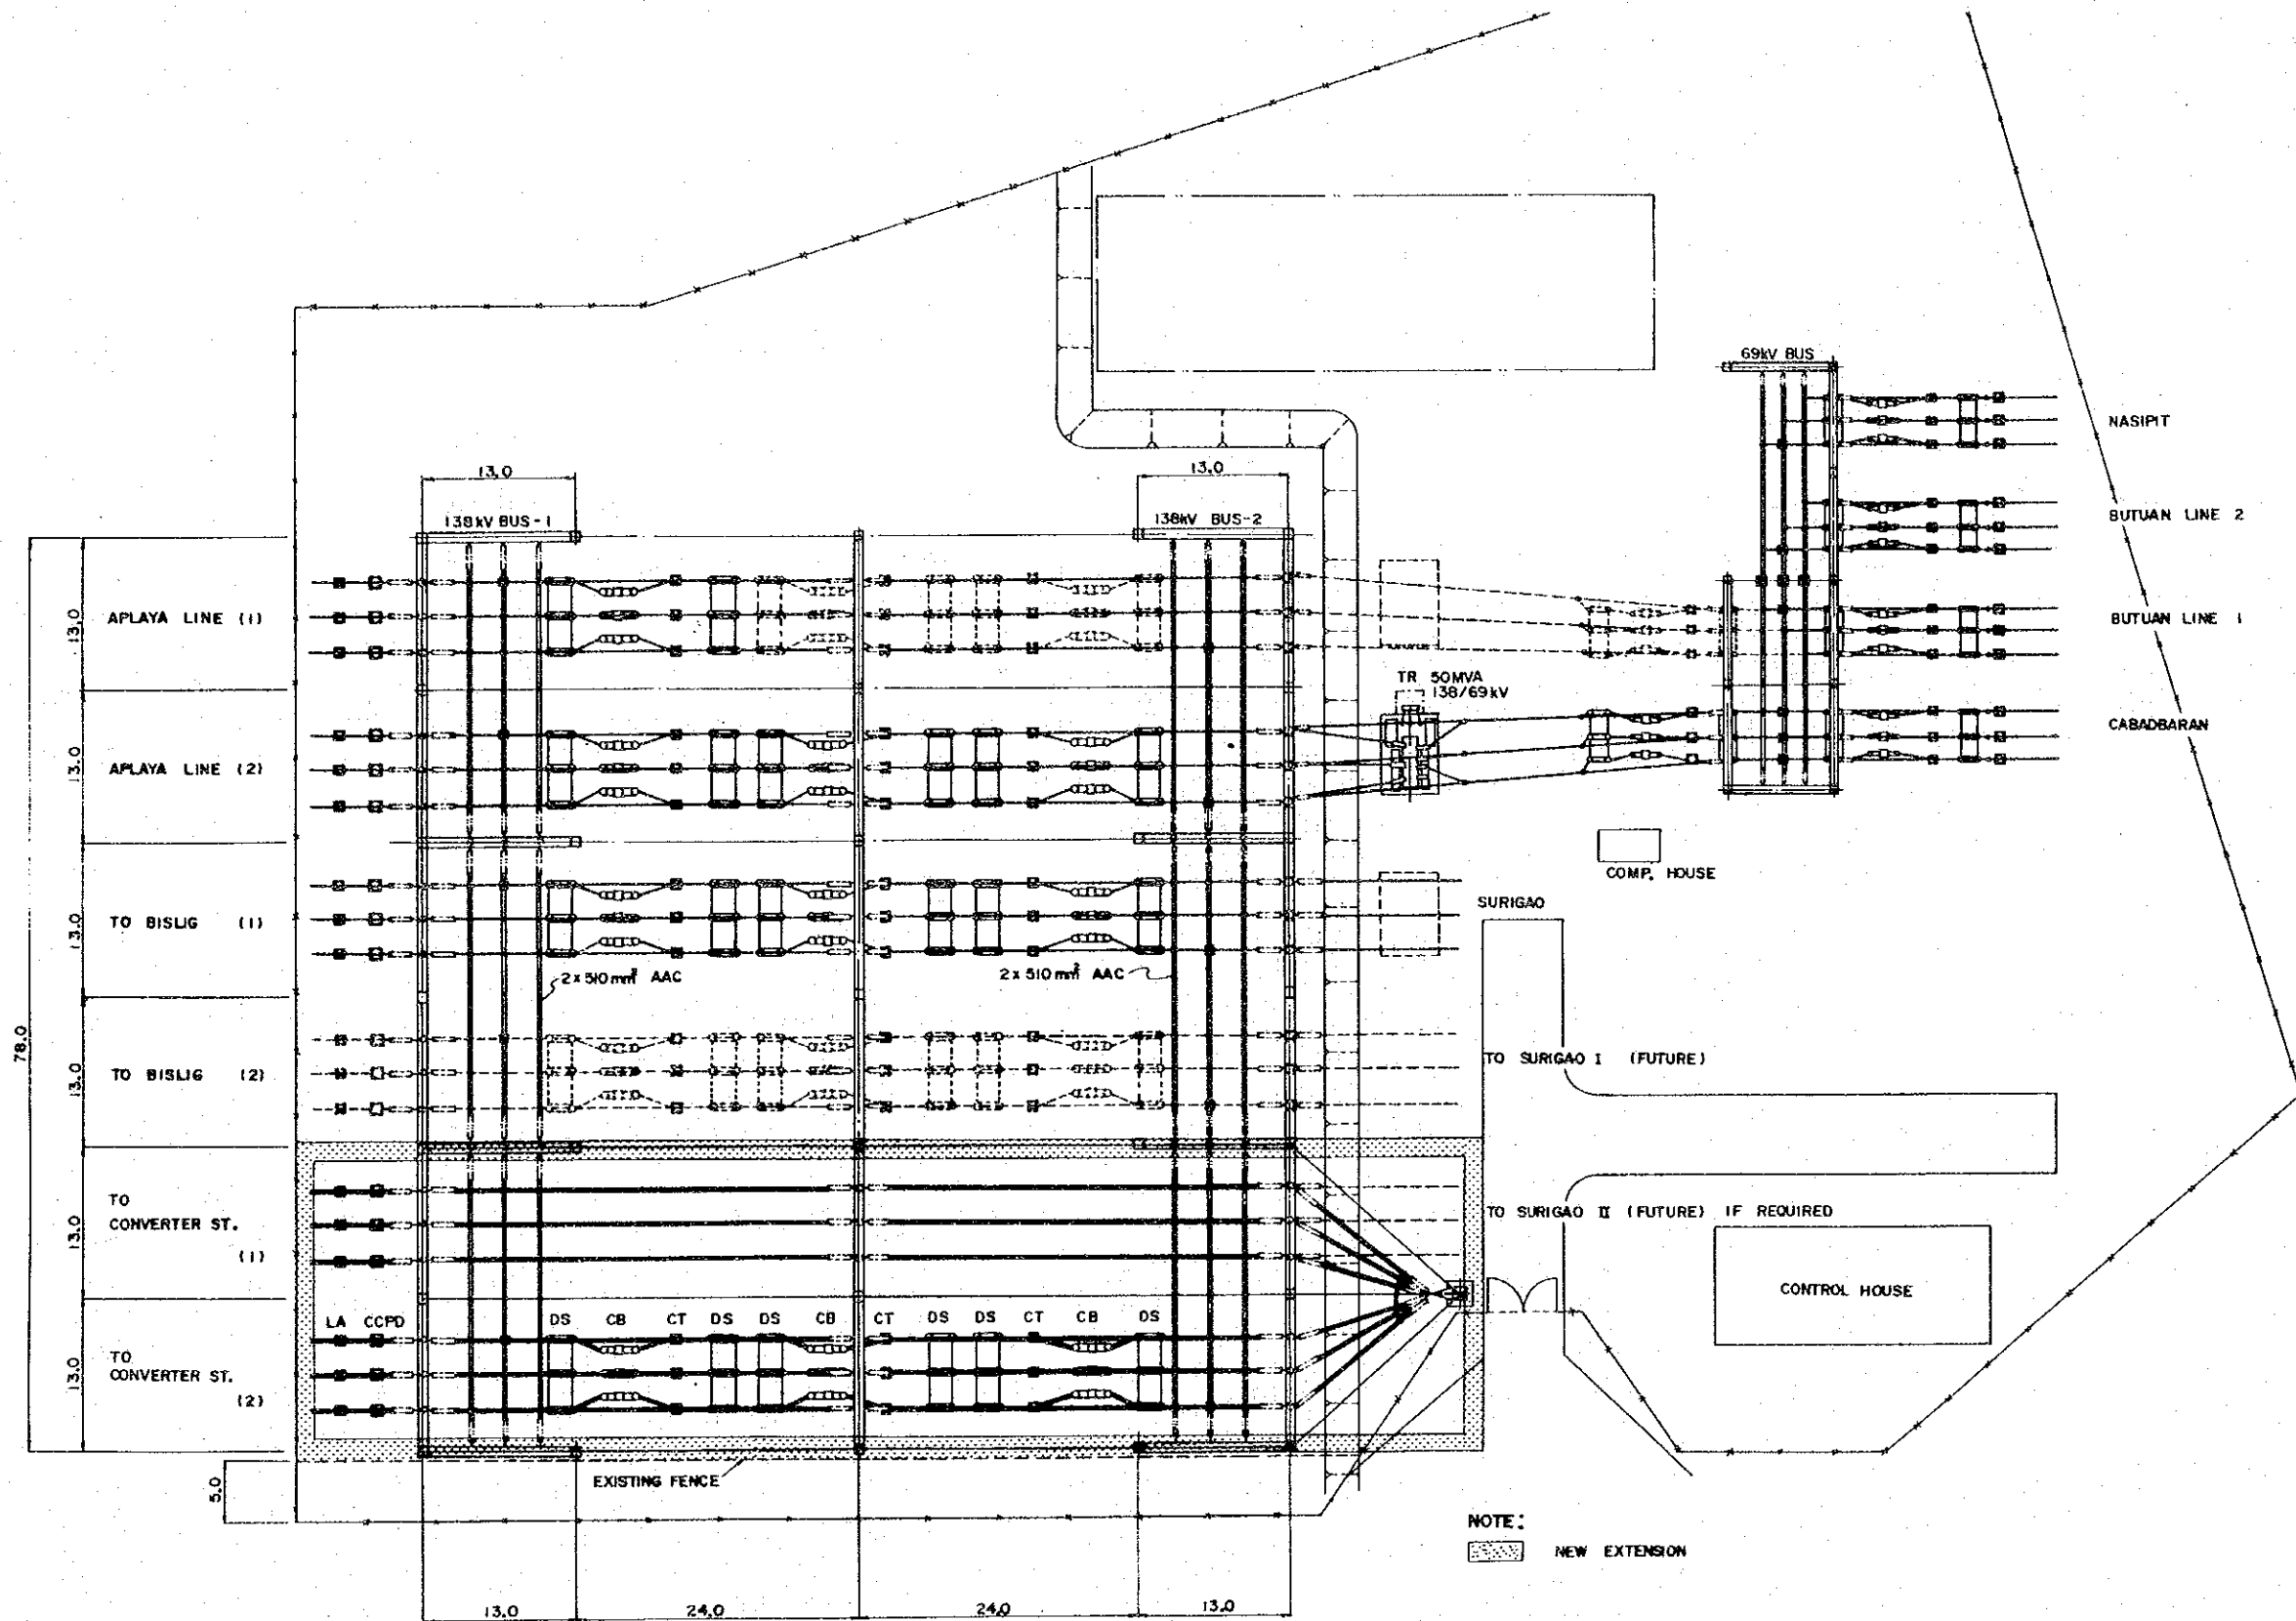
LAYOUT OF BUTUAN SUBSTATION (TENTATIVE)
